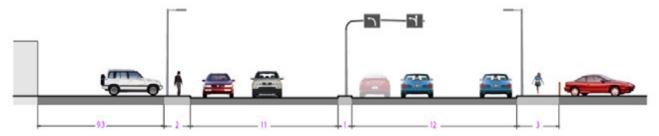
Figure 6.7: 22nd Street to 23rd Street Section
